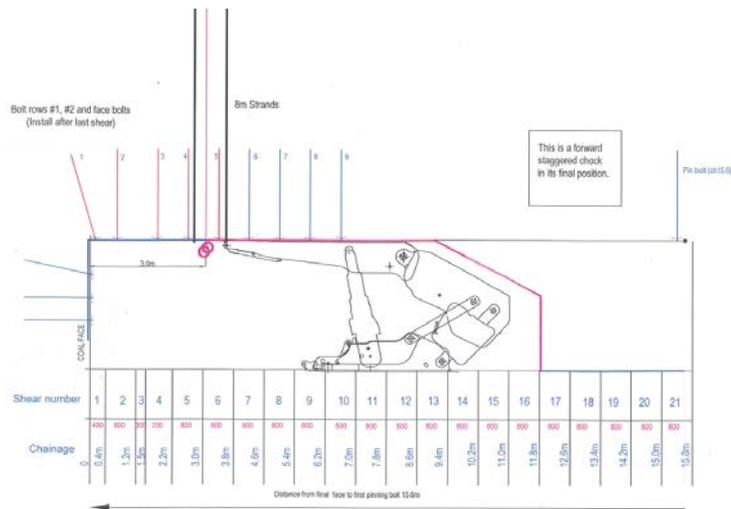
Typical Dendrobium bolt up arrangement (Longwalls 6-10)
